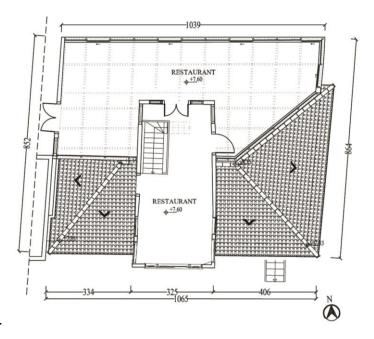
The second floor plan of Boyacızade Konağı in 1/100 scale (Redrawn by author).
